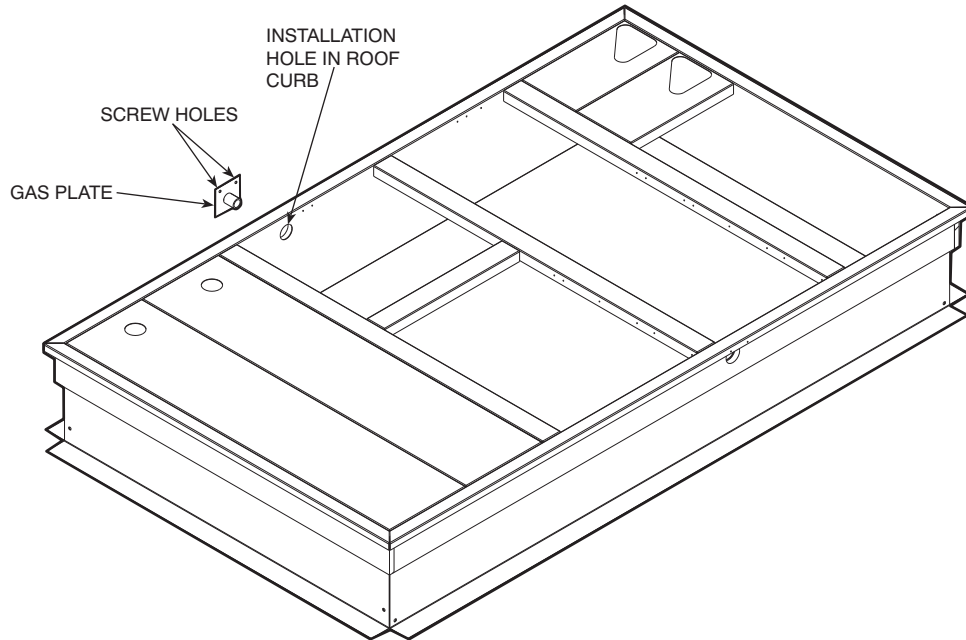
Gas Plate Installation (CRRFCURB031A00 Shown)
